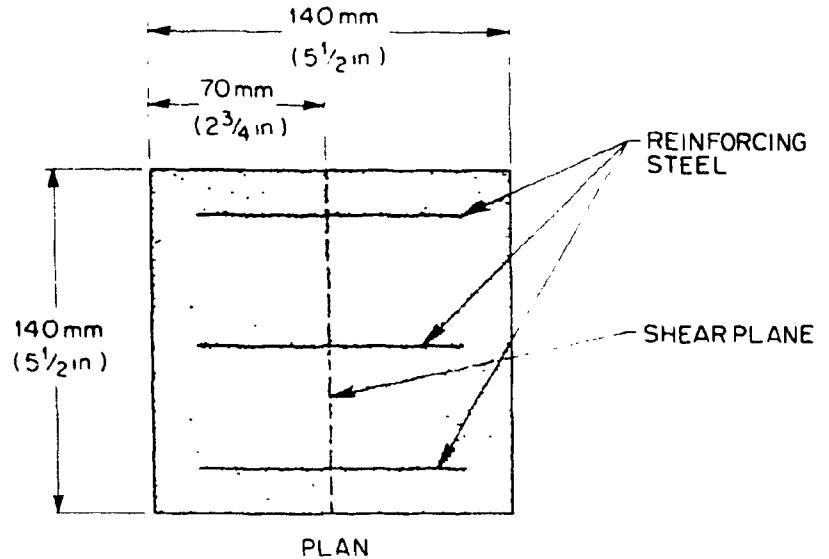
S-shaped parallelepiped shear strength test specimen.
